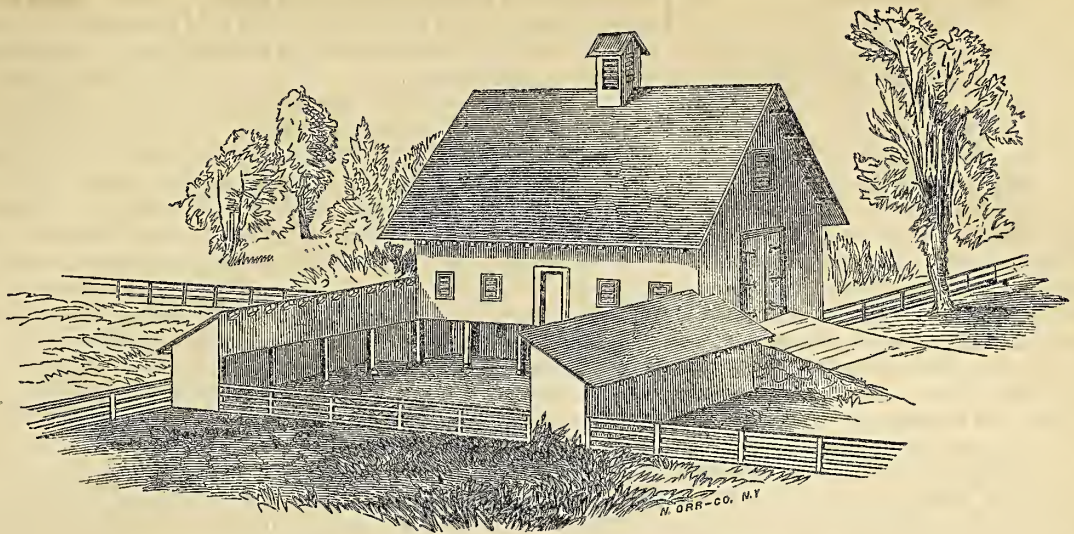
BANK OR SIDE-HILL BARN—ELEVATION.
